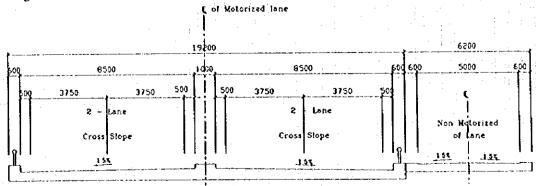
Cross Section of Flyover (on Ring Road No.3/Railway)
